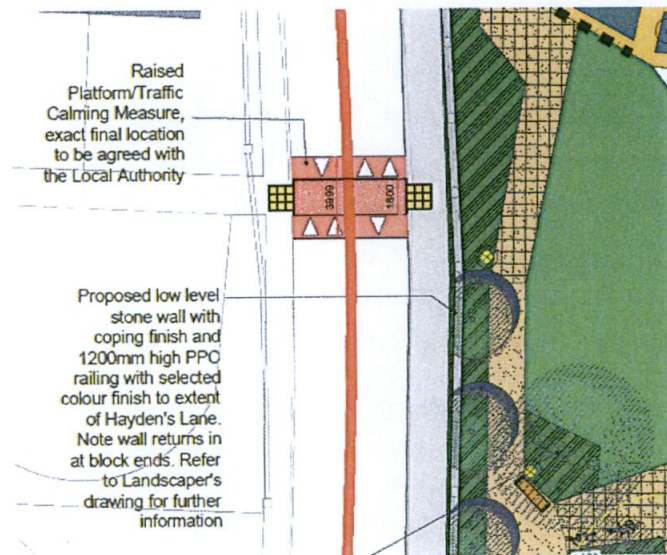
Extract of Site Plan Showing Connection Hansted Park
